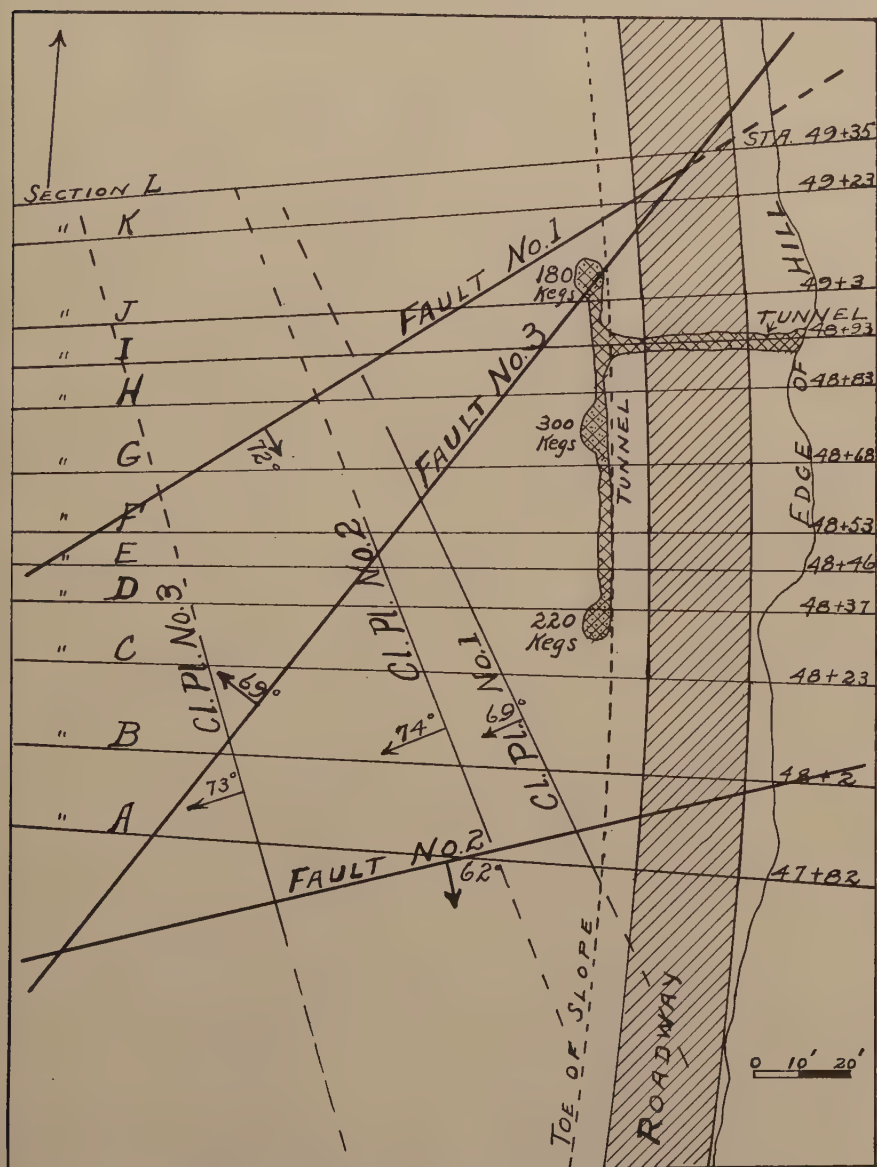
PLAN OF FAULTS AND CLEAVAGE PLANES ON ROAD LEVEL.
